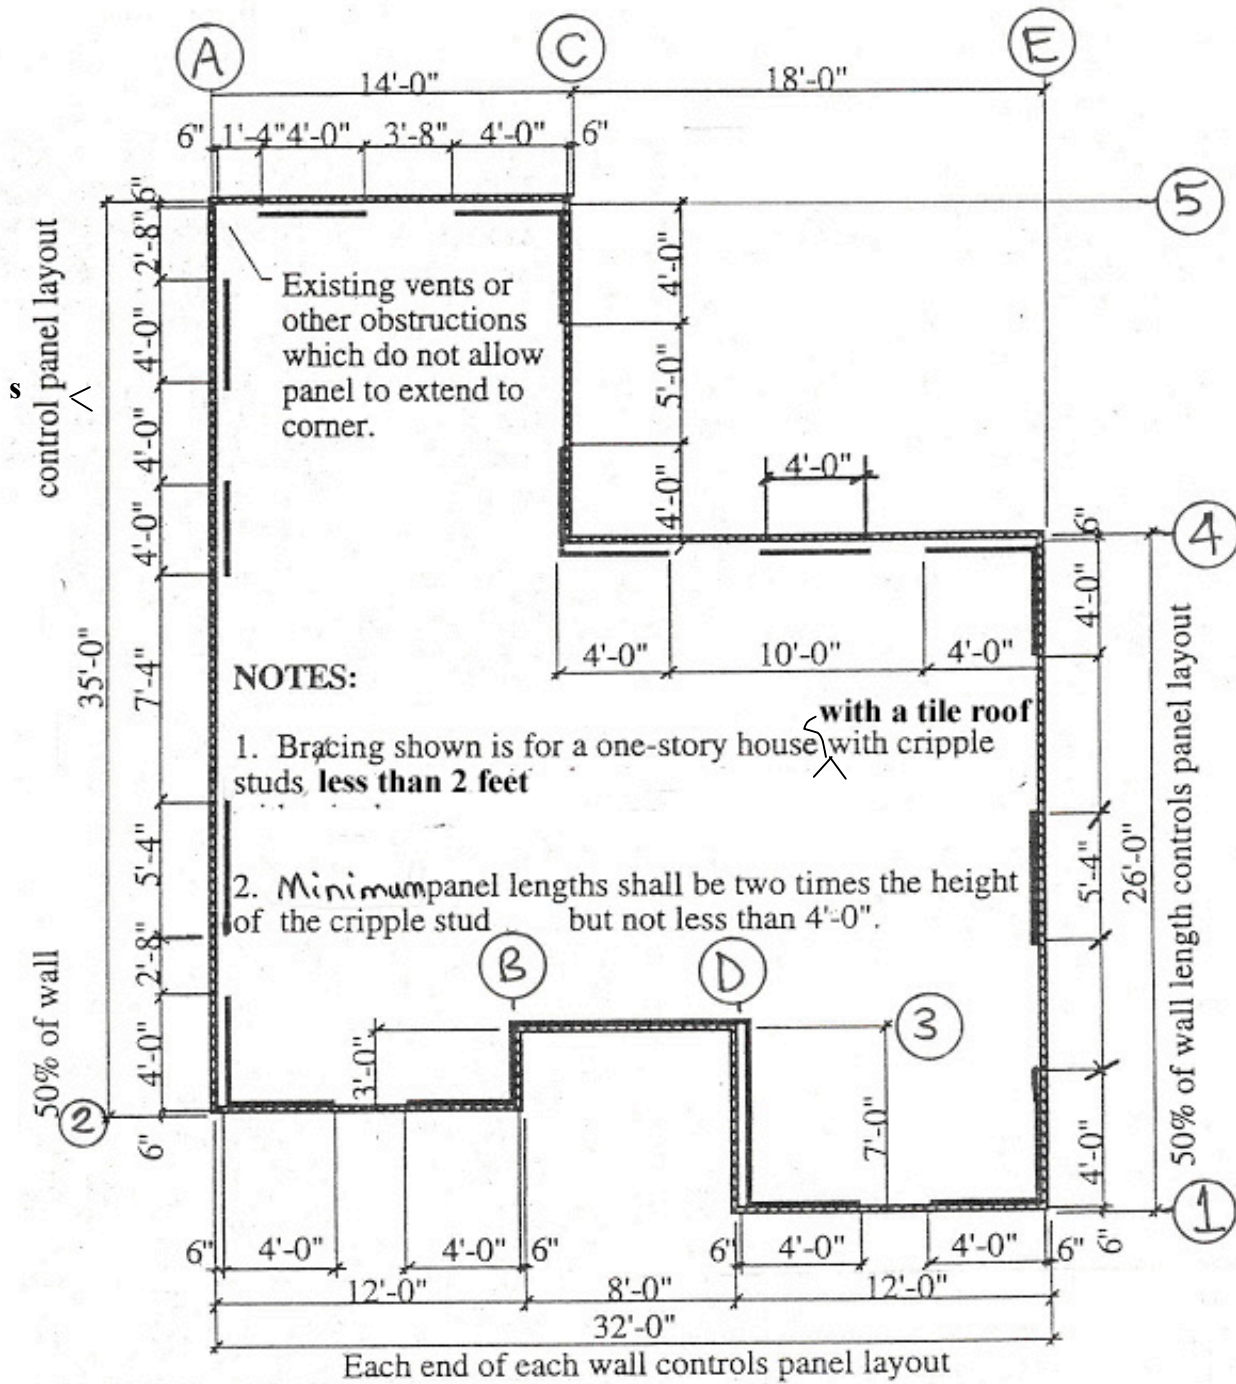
FIGURE NO. - CRIPPLE WALL BRACING PANEL LAYOUT
